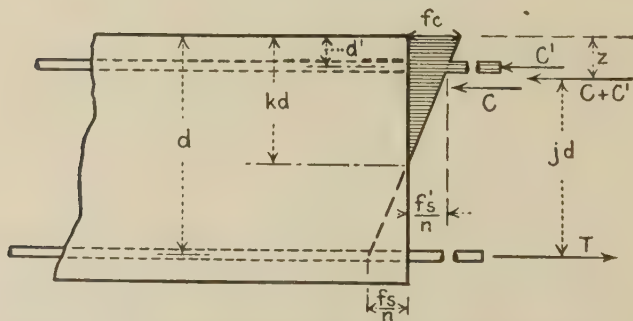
Nomenclature for Concrete Beam Reinforced for Tension and Compression.
